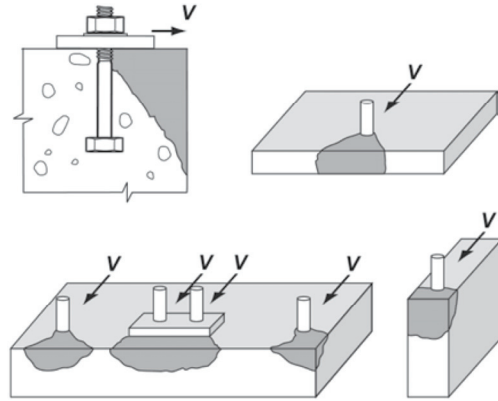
Concrete Breakout Failure of Anchors in Shear (ACI 2014, KCI 2012)
